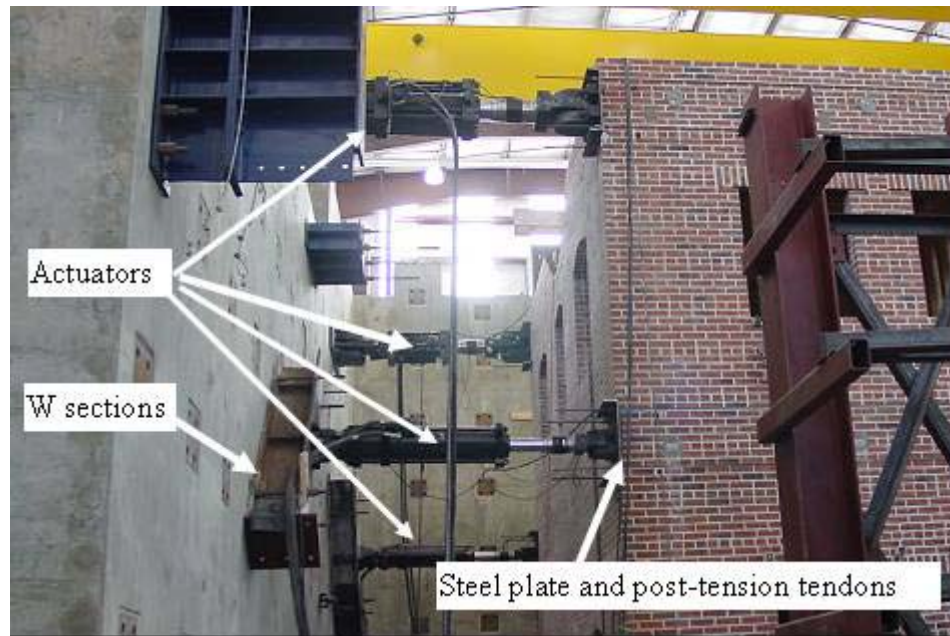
Connection details for connecting the actuators to the masonry walls, view looking east
